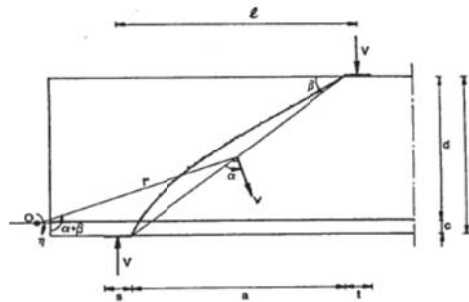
Shear failure of reinforced concrete beam without stirrups (hyperbolic yield line) (Braestrup, 2009).
